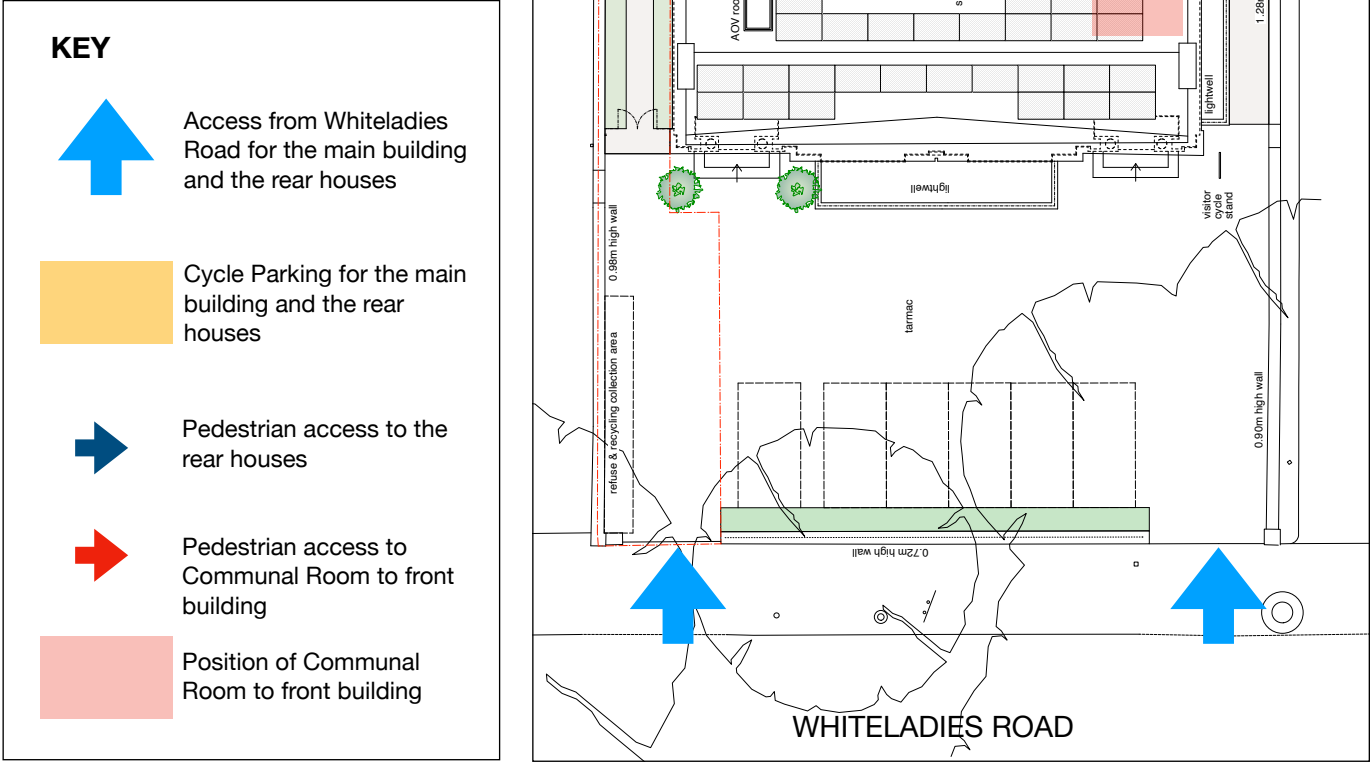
Proposed site plan indicated key access points, cycle parking and communal facilities
